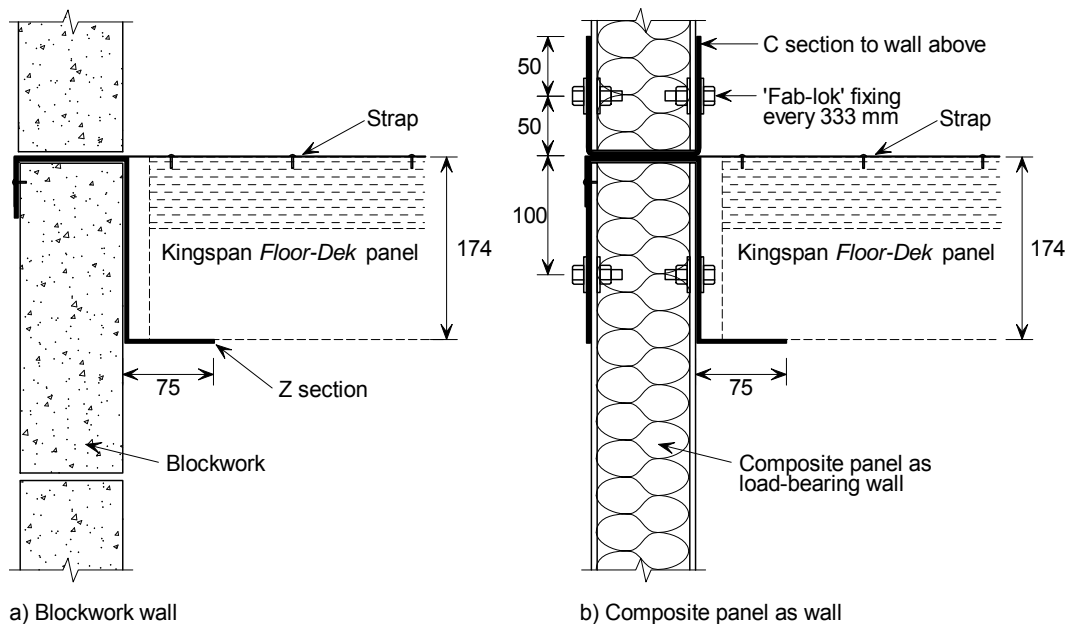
Floor-Dek* floor supported by either by blockwork or load-bearing composite panels
